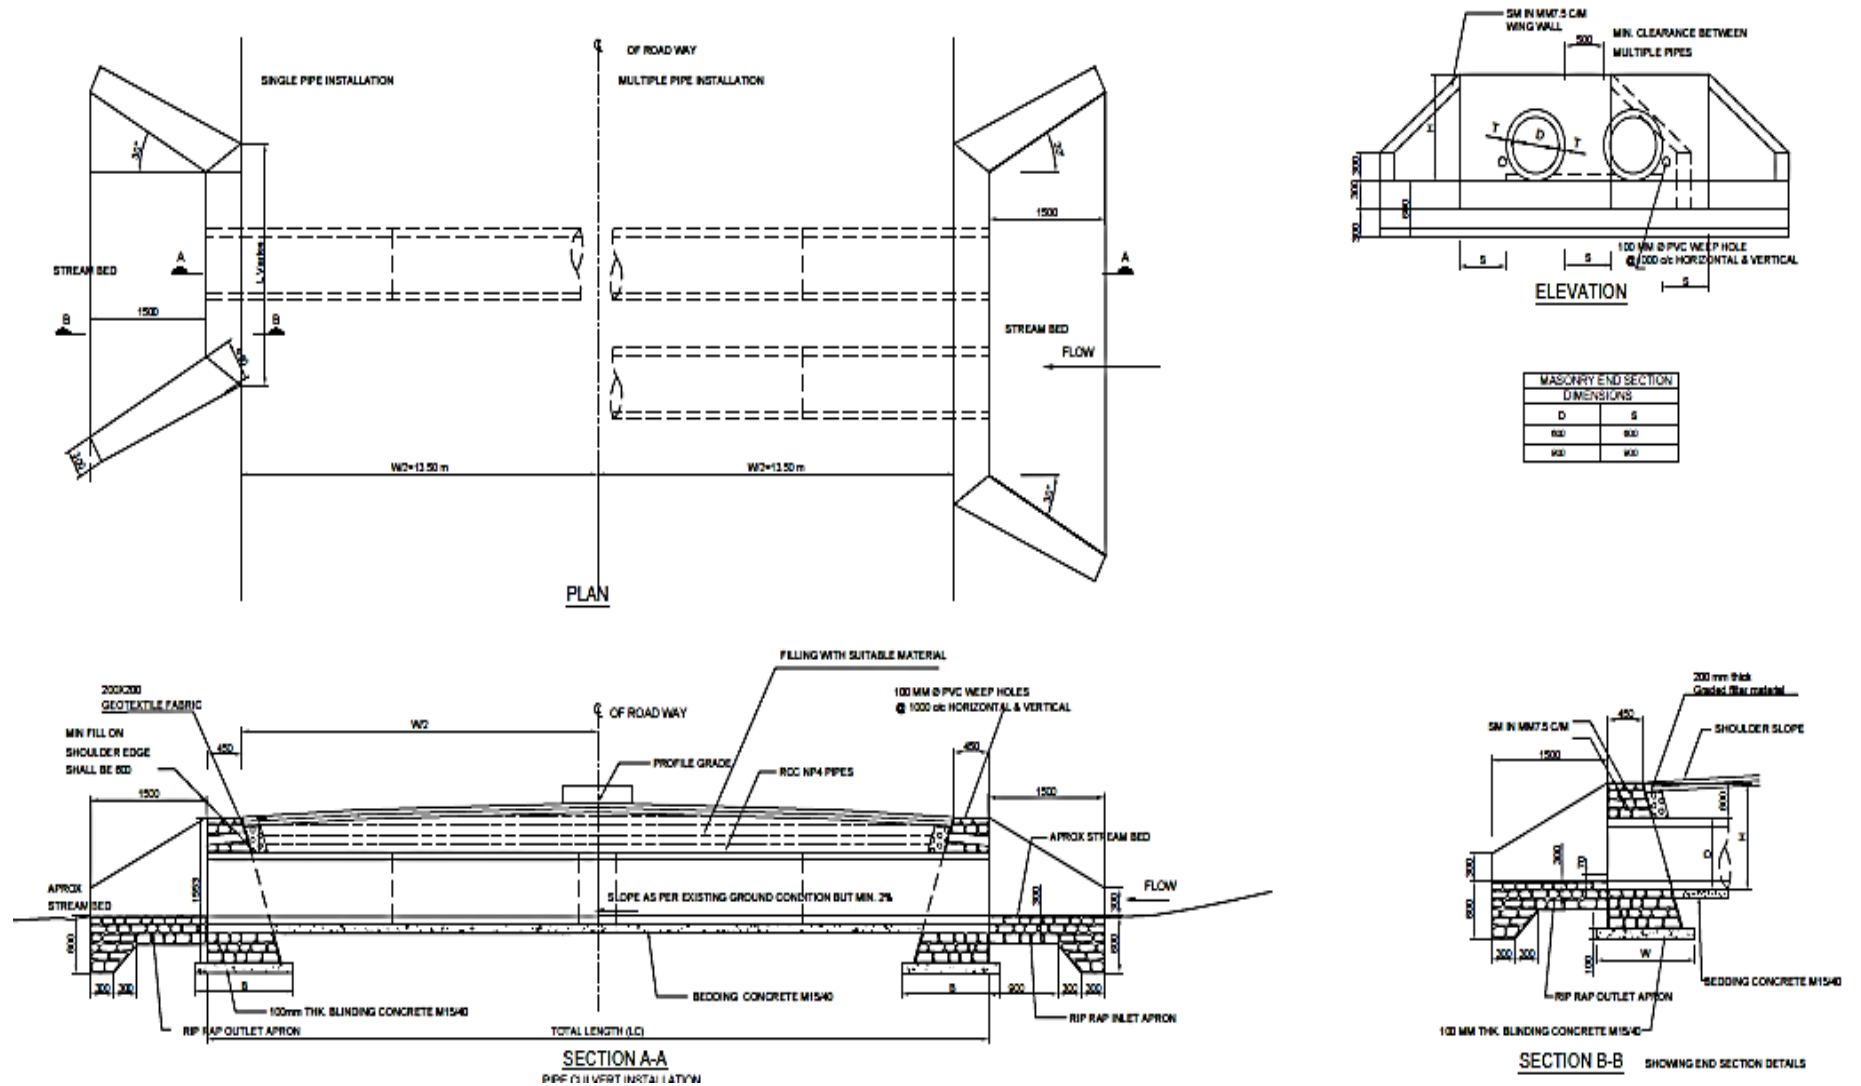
Typical Pipe Culvert Plan and Sections in Tilottama
